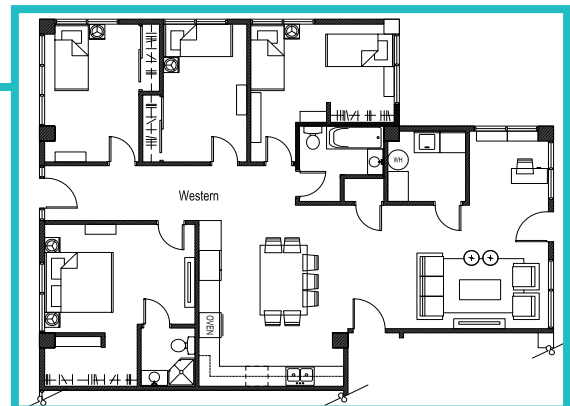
Apartment floorplan and furniture layout by Valerie Jenkins.
